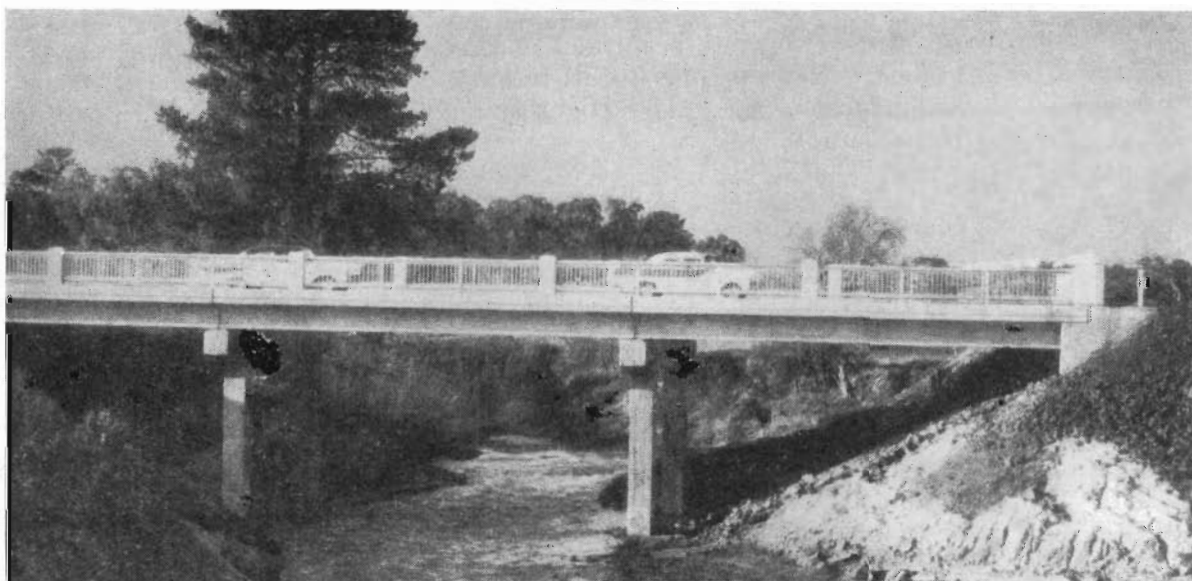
Pre-stressed concrete beam and reinforced concrete bridge—McCrae Street—City of Dandenong.
